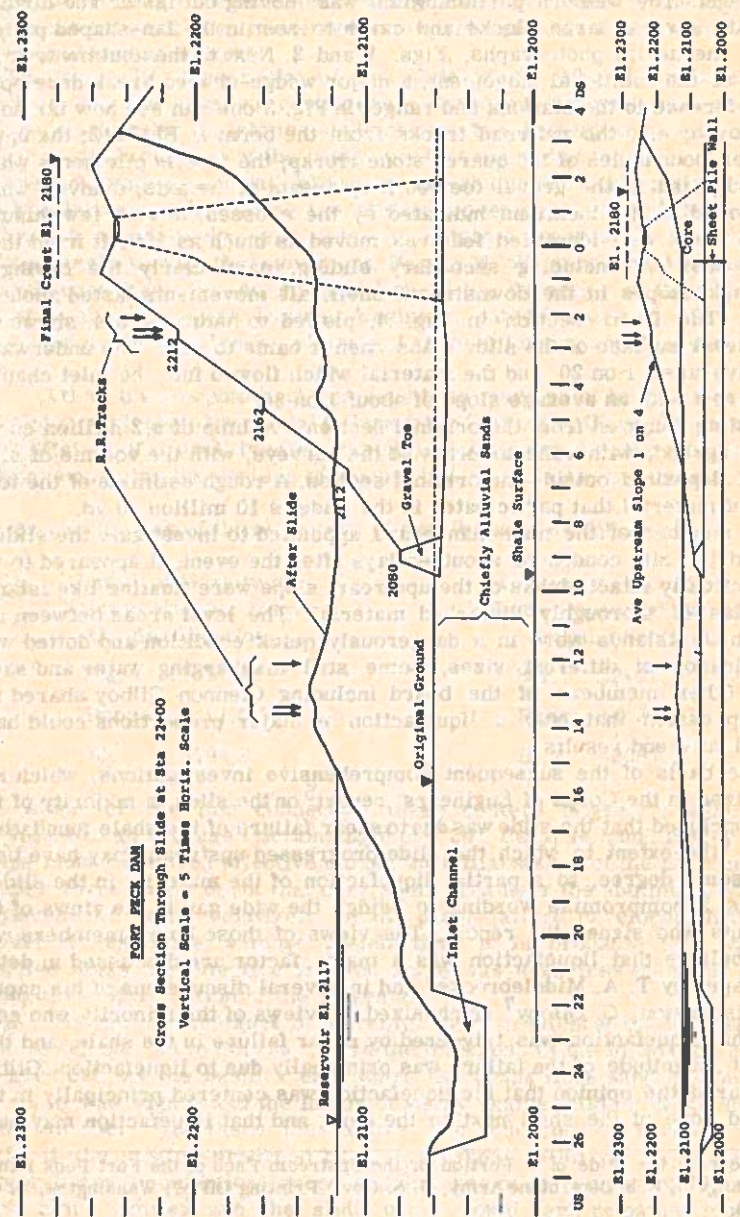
CROSS-SECTION OF SLIDE AT STATION 22+00
